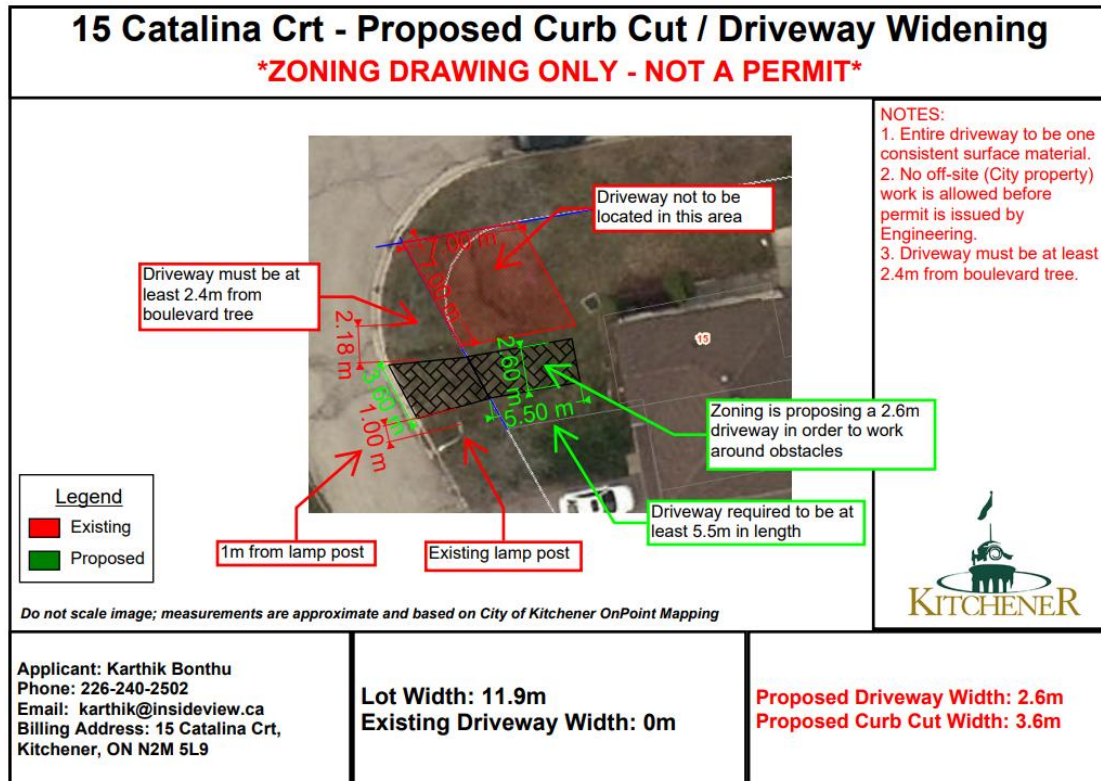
Figure D – Curb Cutting/Driveway Widening Drawing For Permit
